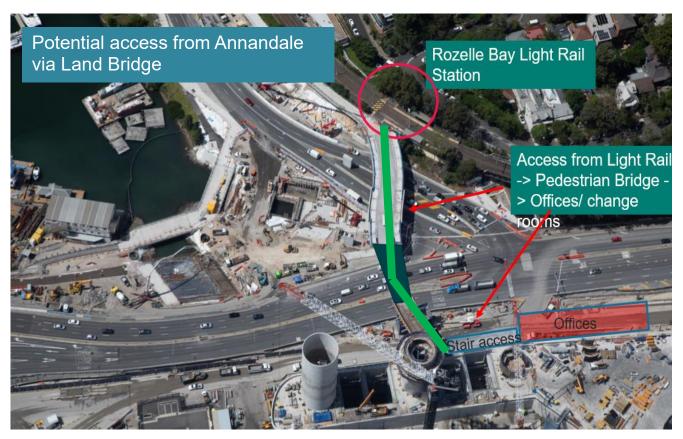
Potential site access via Green Link pedestrian and cyclist bridge
